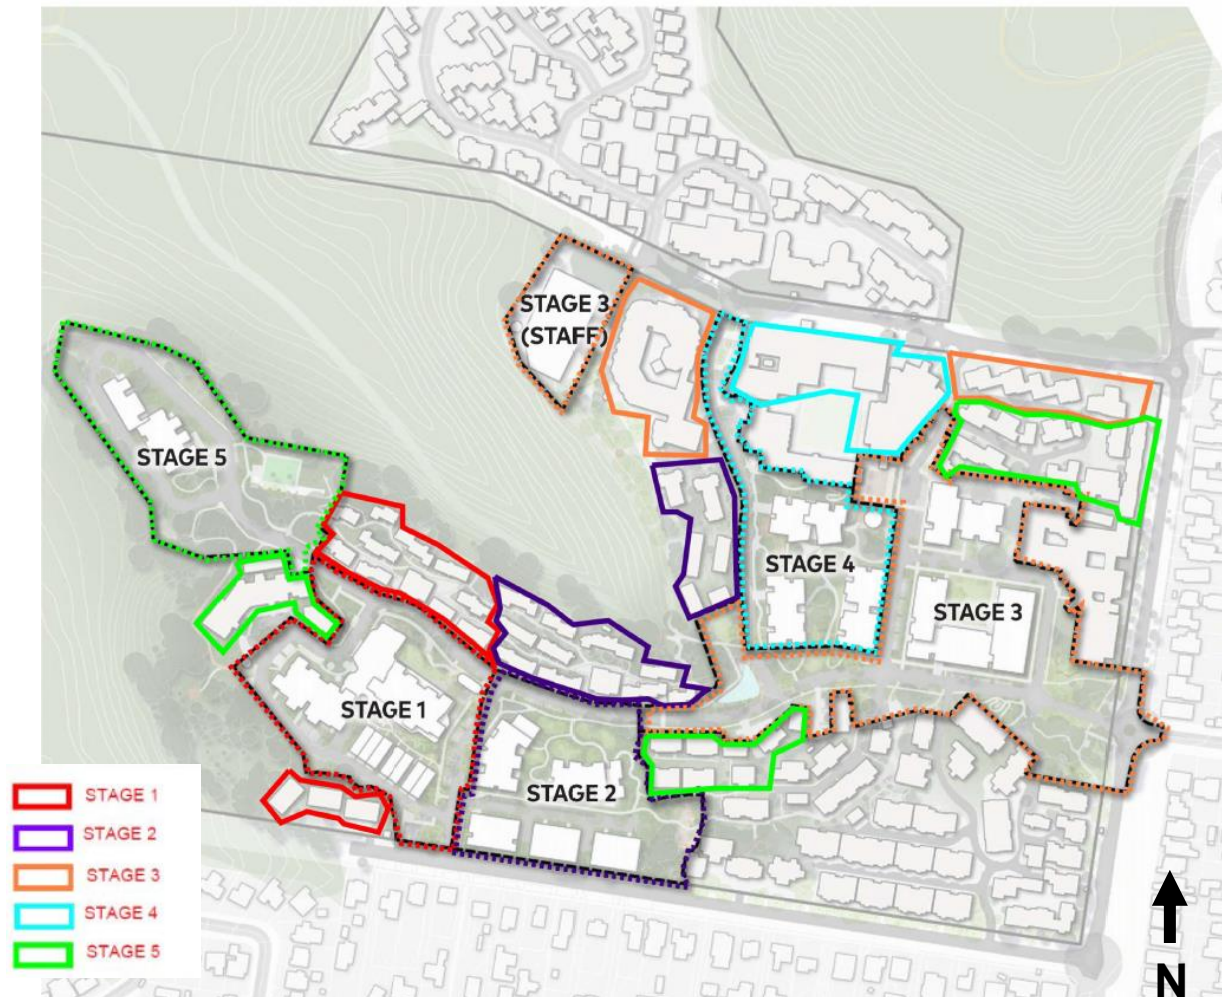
Aerial view of the subject area overlaid with the proposed staged ember upgrade.
